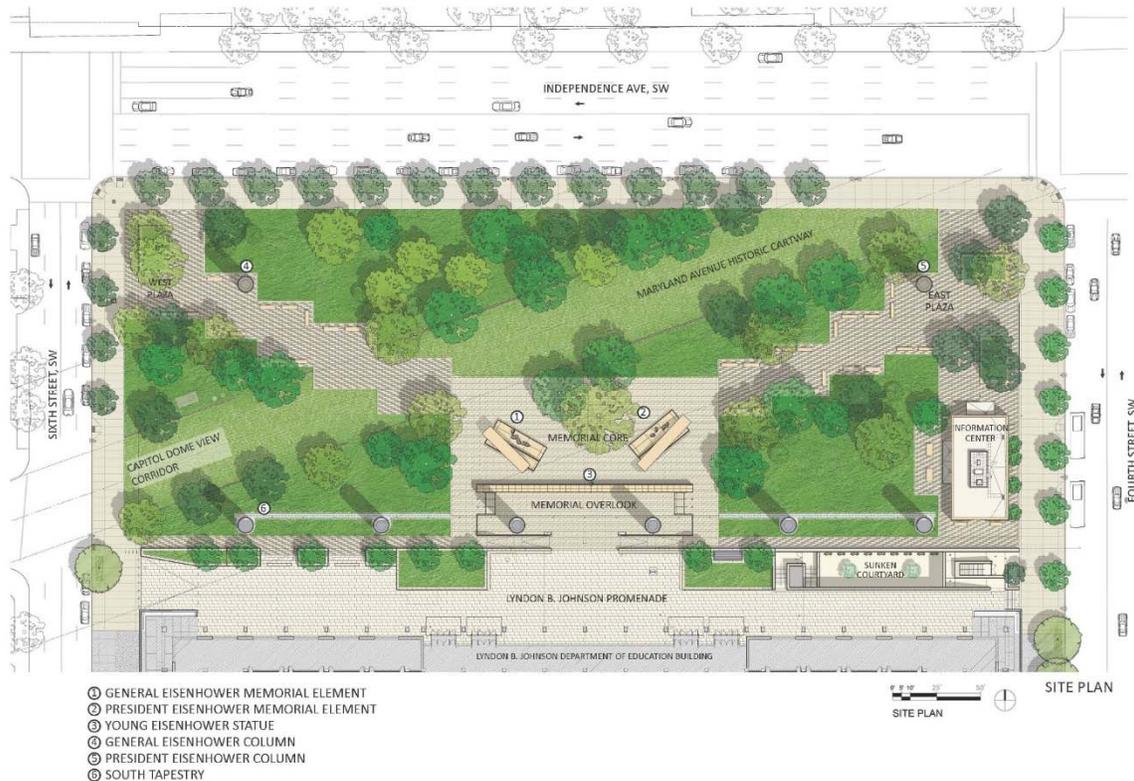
Proposed site plan of the Dwight D. Eisenhower Memorial
